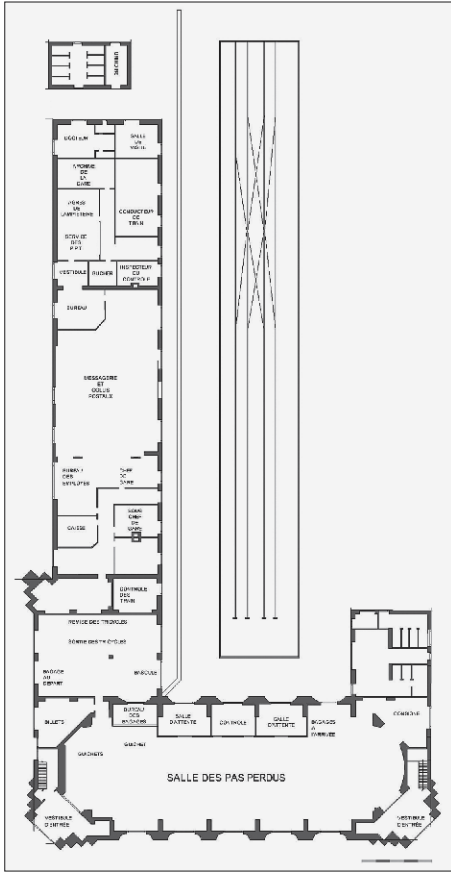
PLAN OF THE SECOND STATION OF BÔNE
